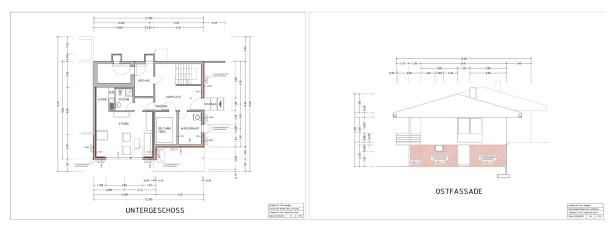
Floor plan and East façade drawings performed for the renovation of the villa.
